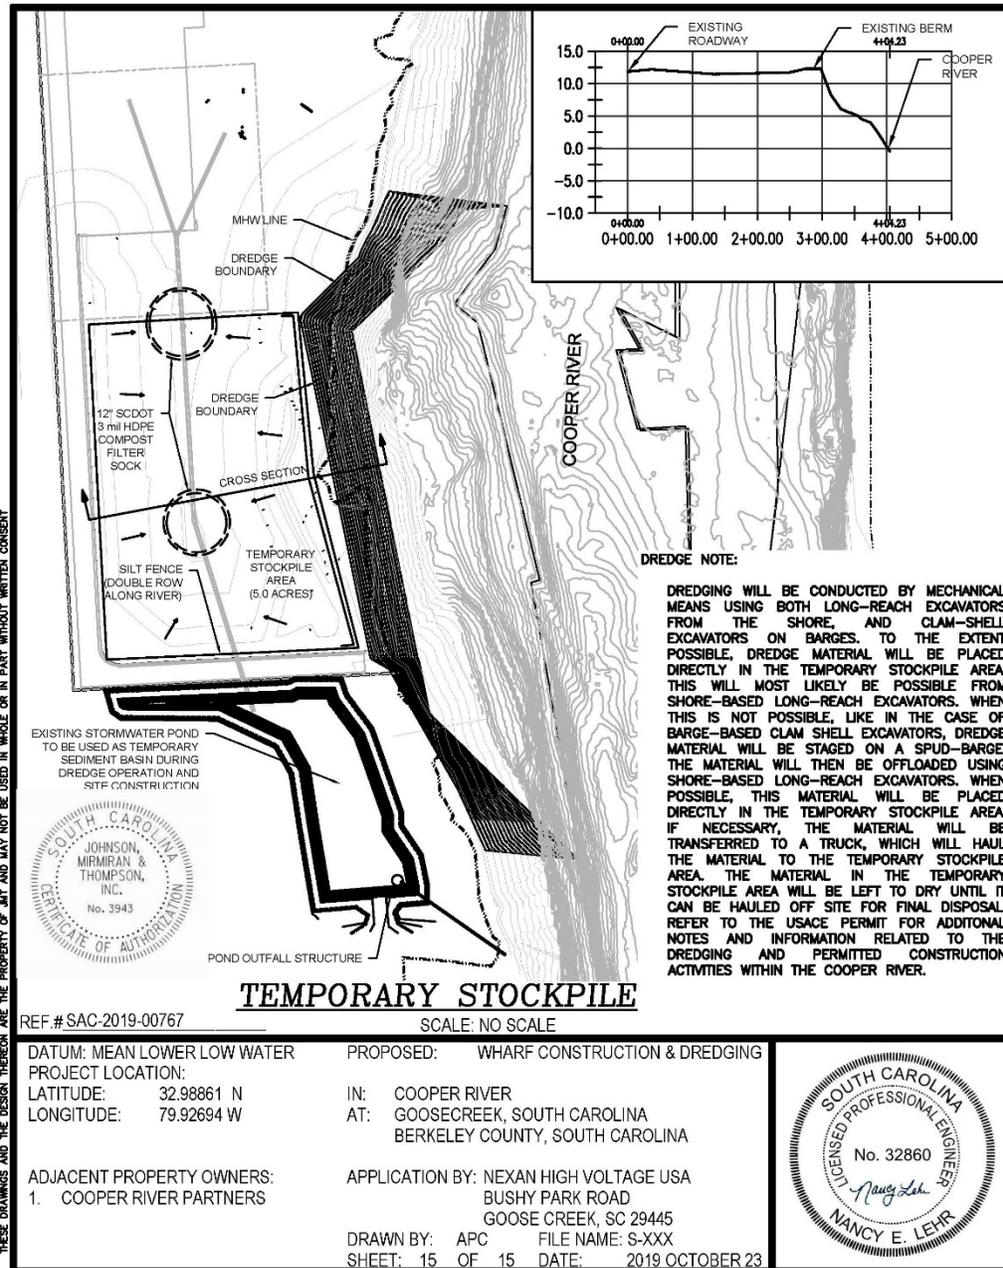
Image showing proposed dredge material temporary stockpile area from permit application figures (revised March 3, 2020), JMT. Image is Sheet 17 of 15.
